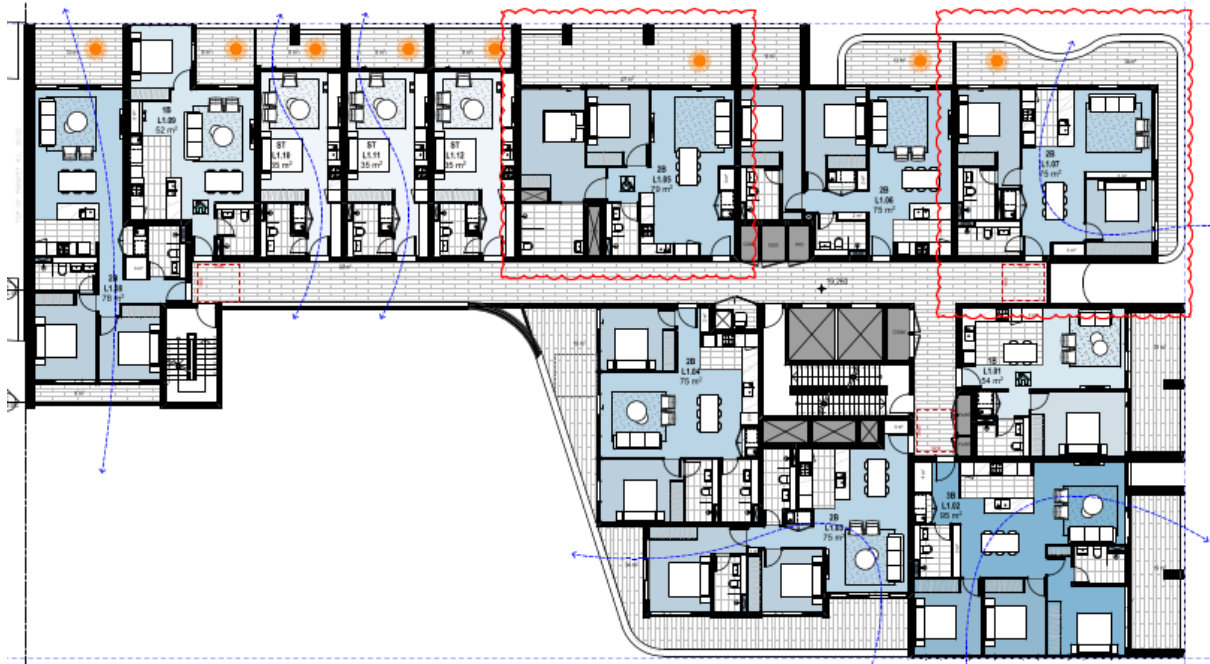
Extract of the approved floor plan of Levels 1-2 in DA2016/170/2.
